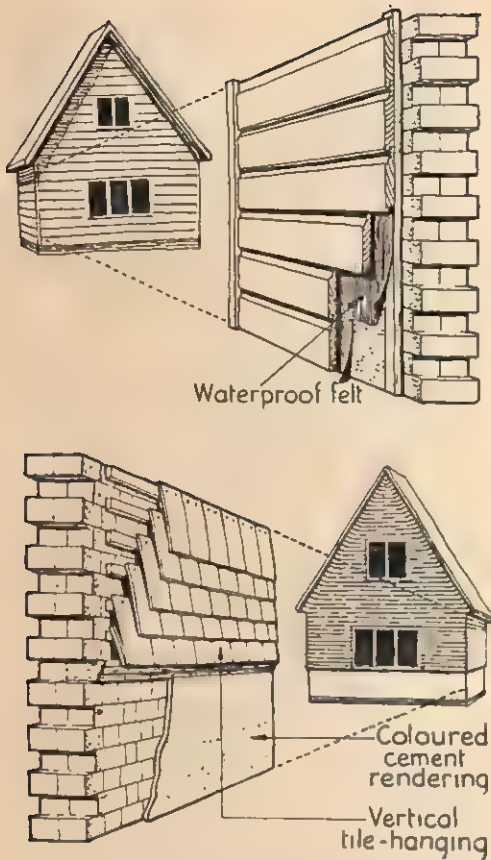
Three ways of covering outside walls. A brick wall of only 9-inch thickness should have some external covering.
